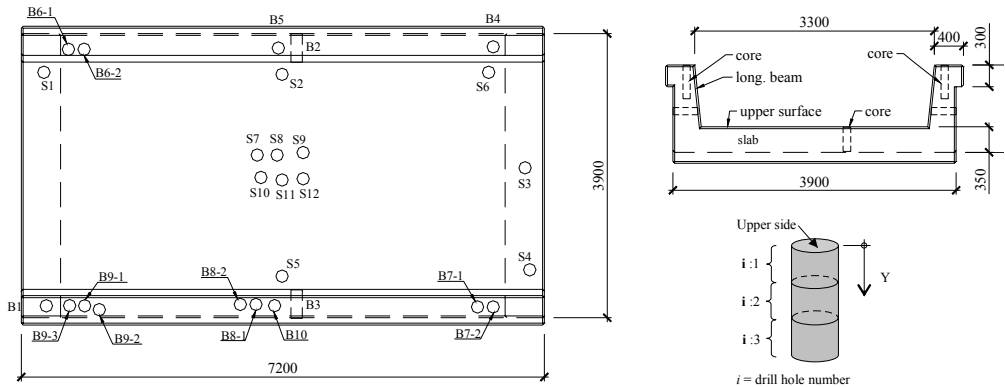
Dimensions and cross-section of the Lautajokki Bridge – a typical Swedish railway reinforced concrete trough bridge. The illustration also shows, in principle, where the cores have been obtained.
